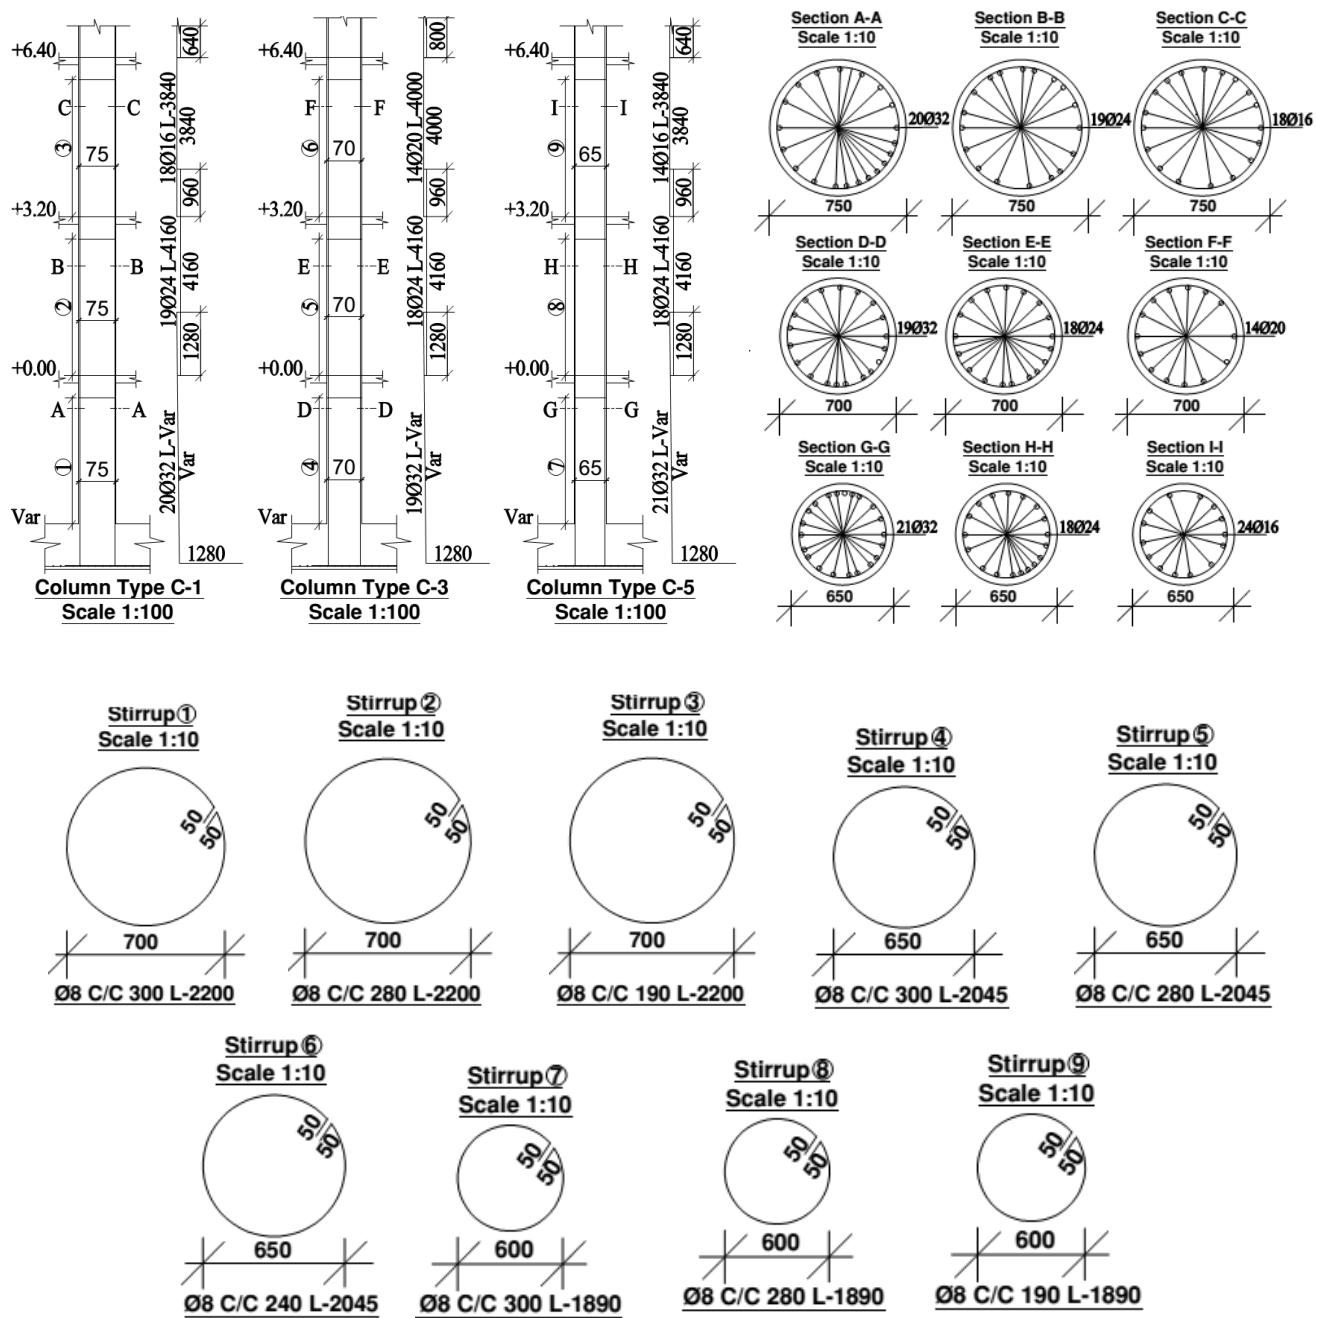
Sample column detailing for G+12 building with C-40 concrete
